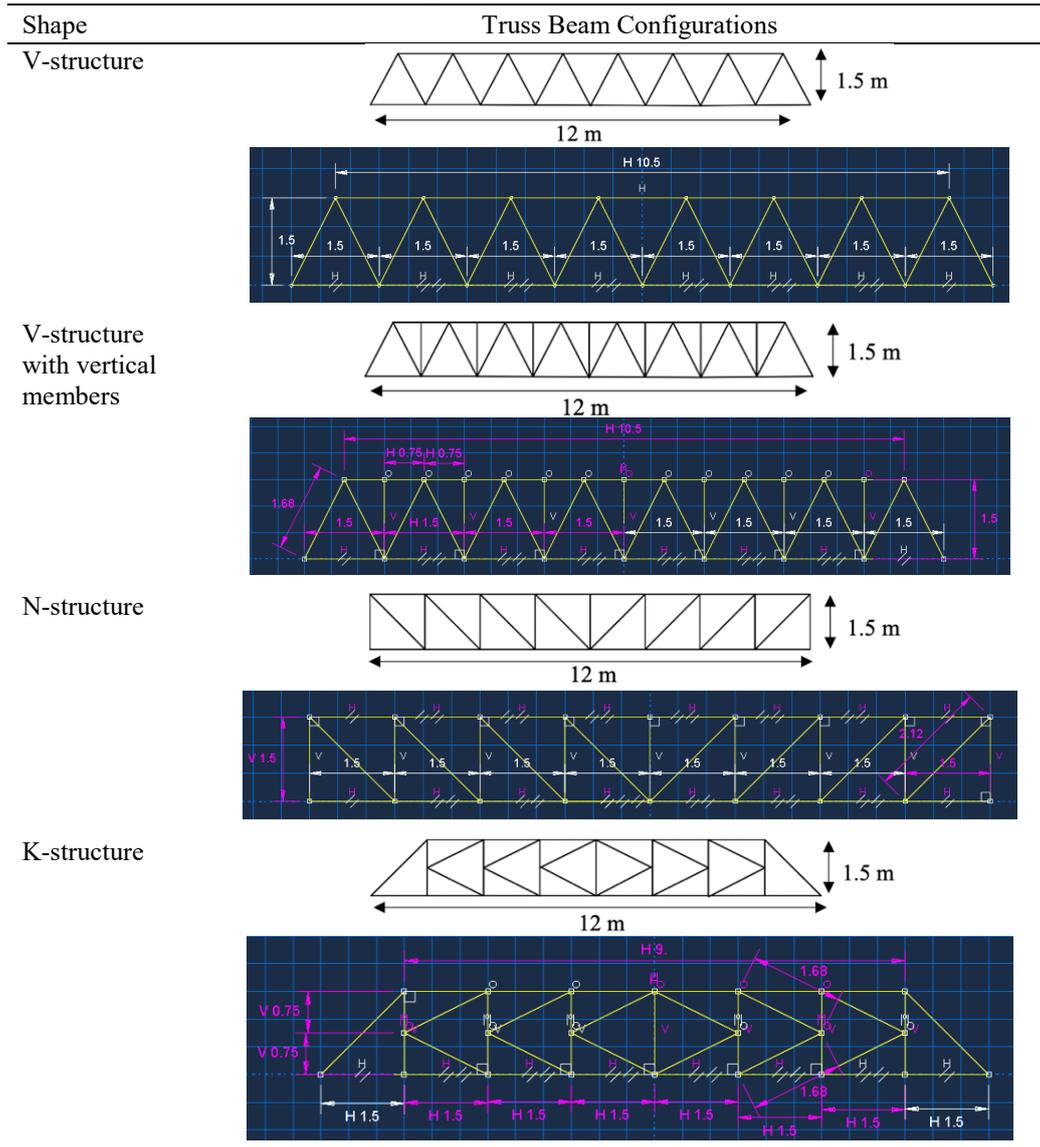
Geometries of the truss design and loading application for (a) V-structure, (b) V-structure with vertical bars, (c) N-structure and (d) K-structure
